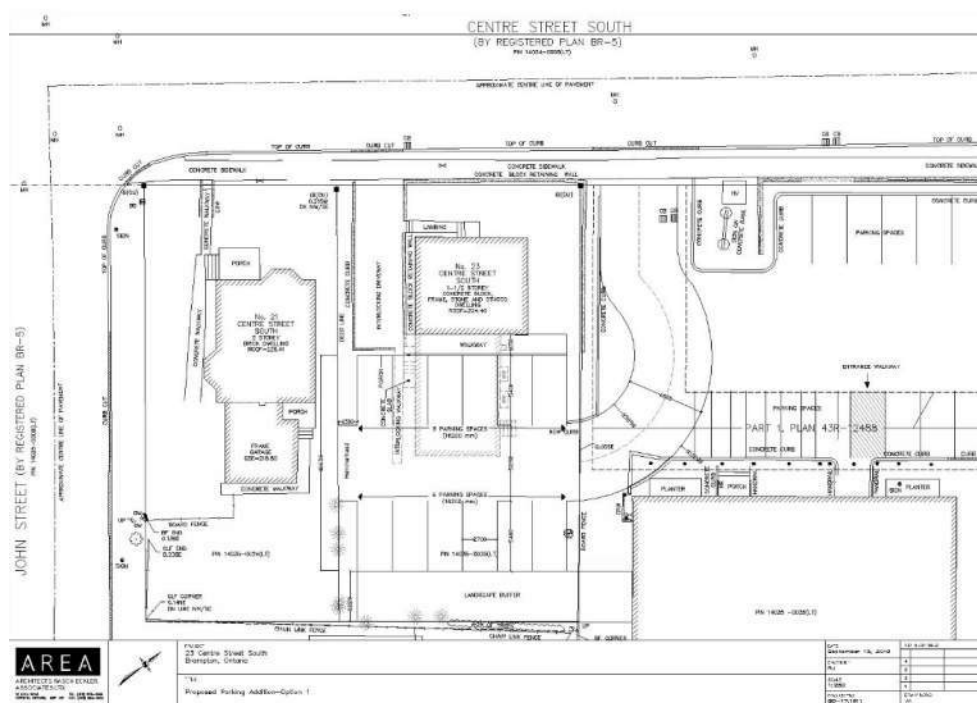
Option 1: Site Plan Drawing with proposed demolition of rear wing and additional parking
